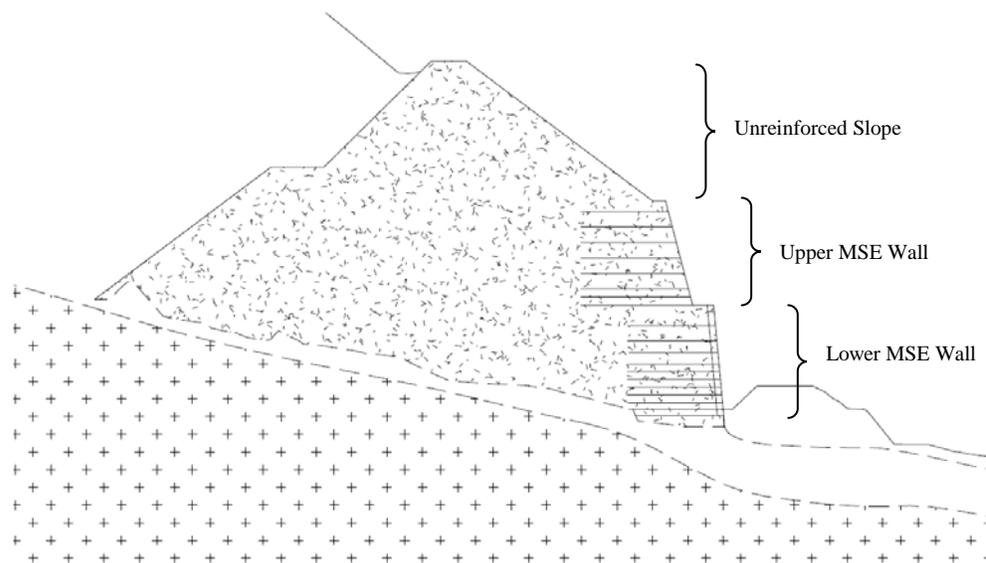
Cross section of the existing geogrid-reinforced toe buttress.
